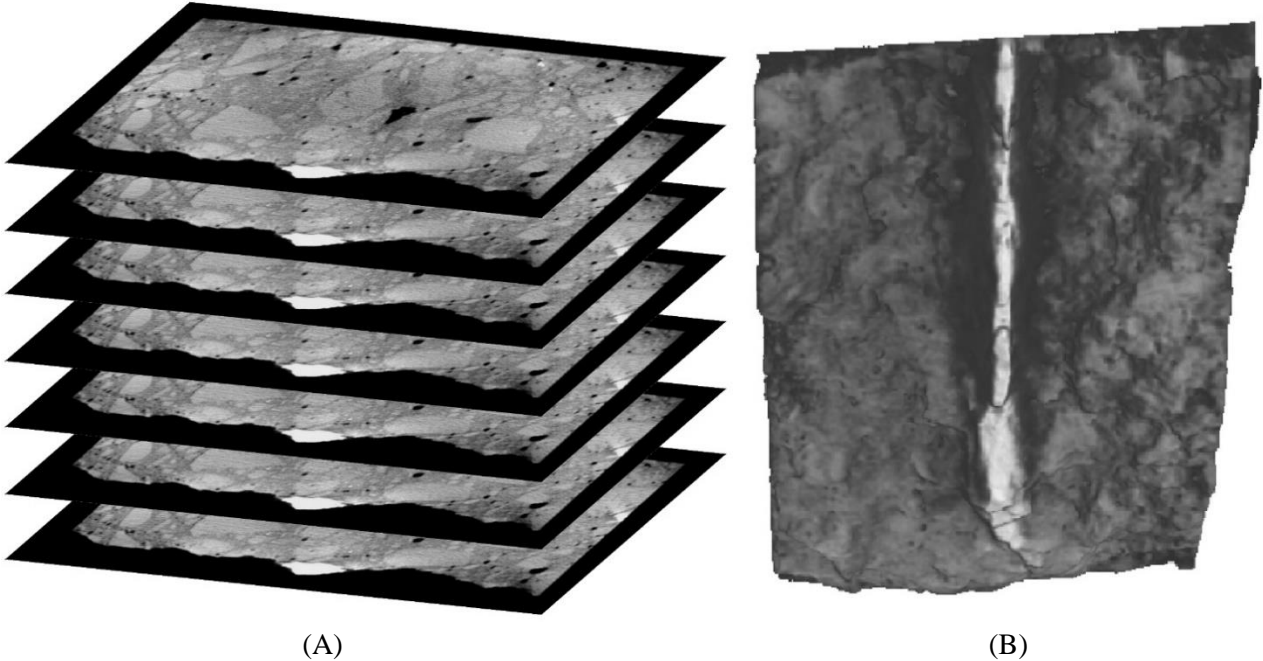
Three-dimensional (A) Image Stacking, and (B) Reconstruction of the Concrete Specimen
